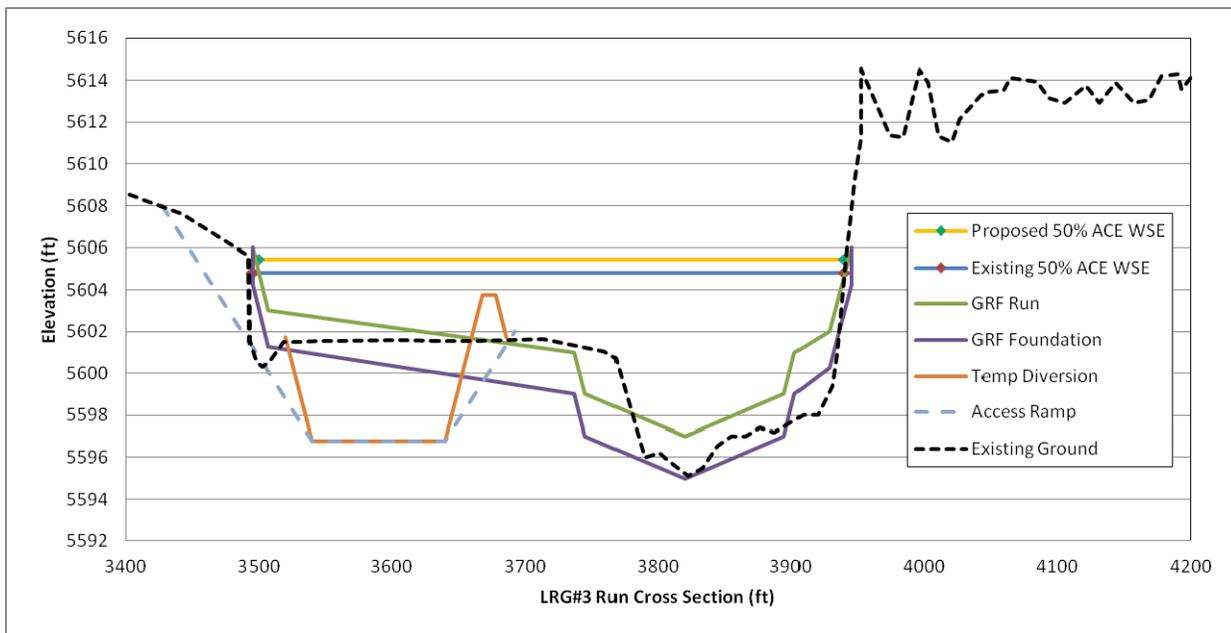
Cross section (downstream view) of the runout of the Lower Rio Grande GRF #3.
